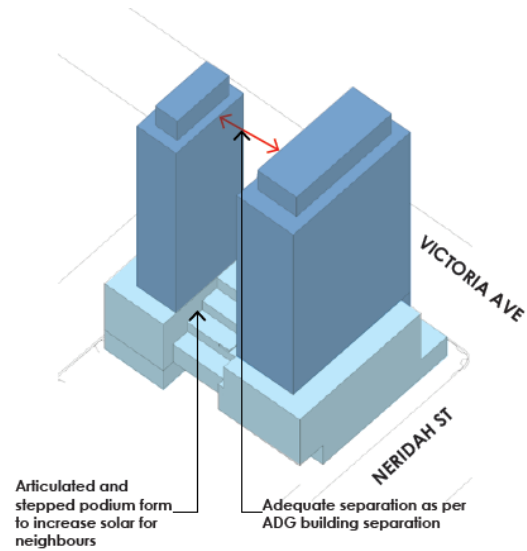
Site plan of block bounded by Bertram Street and Neridah Street and Victoria Avenue (source: APlus Design Group)
